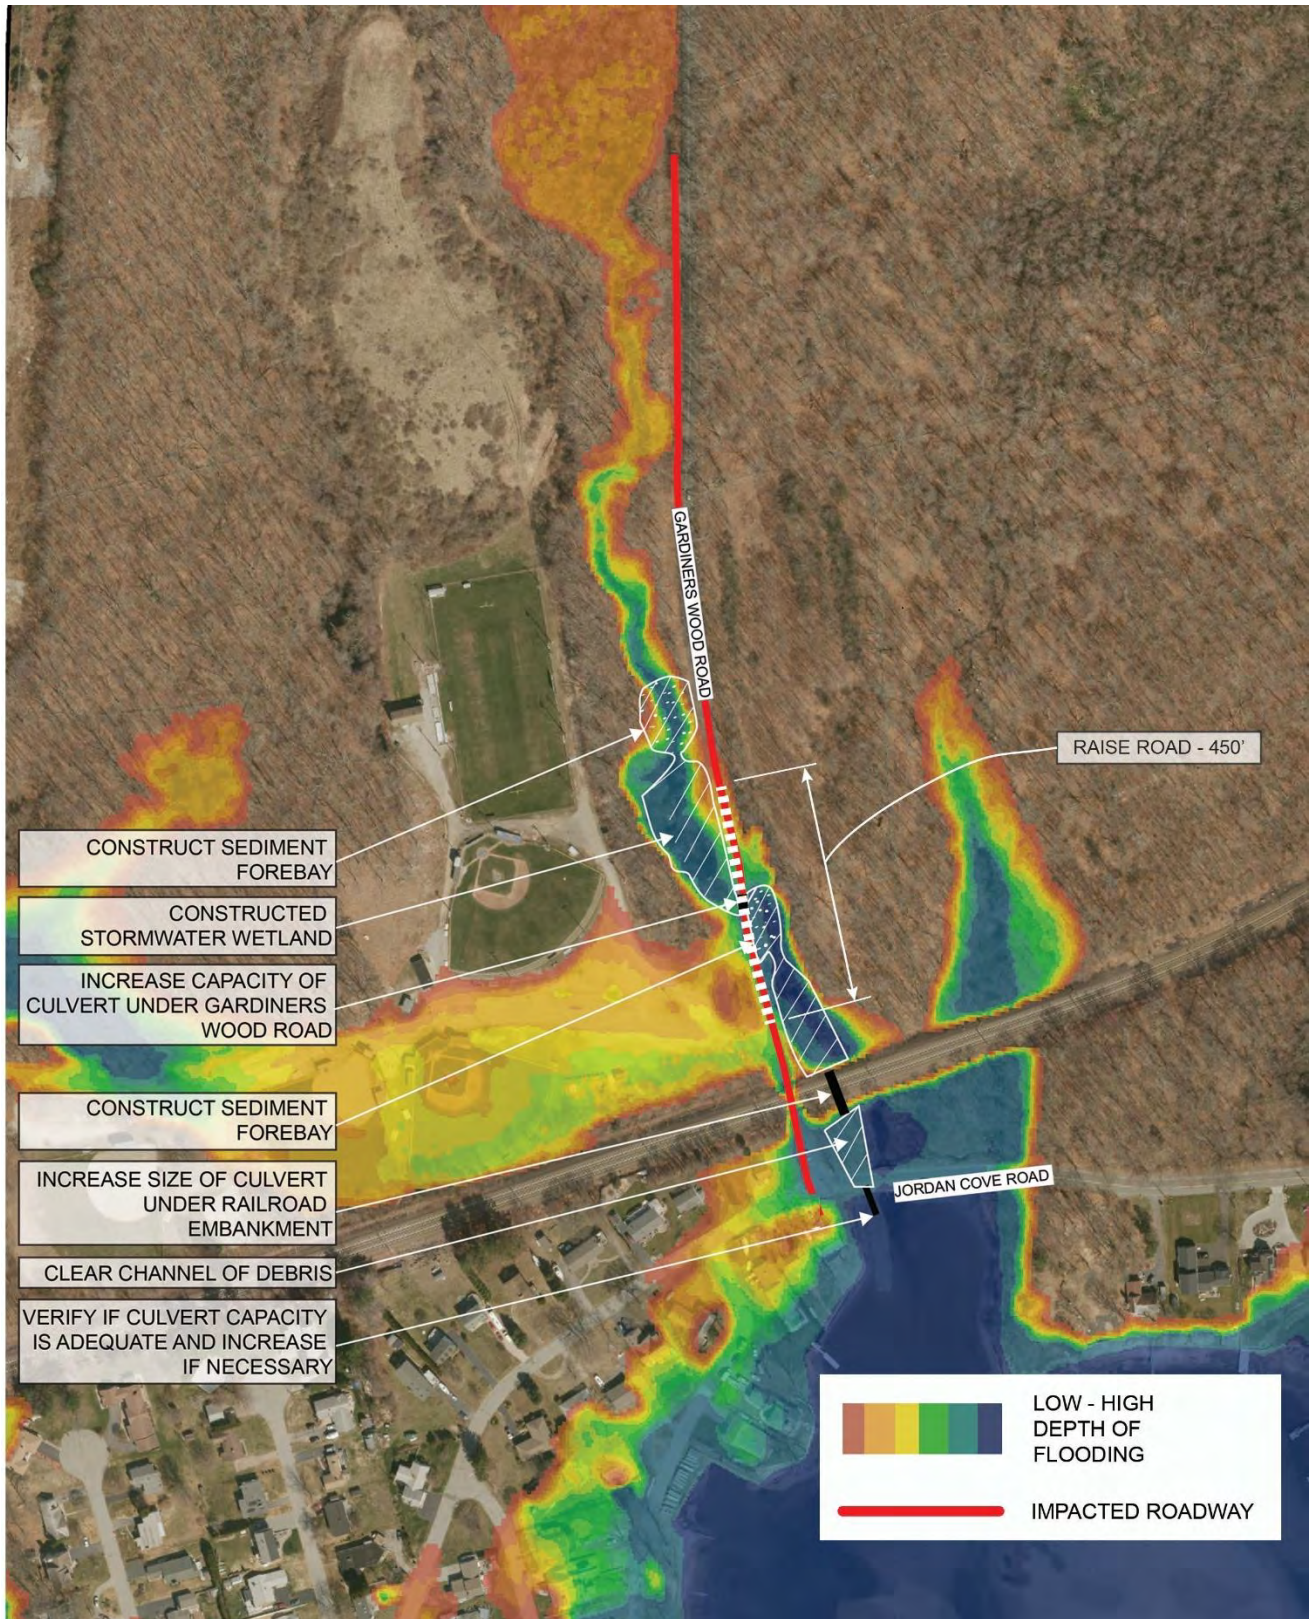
Gardiners Wood Road Adaptation Strategy No. 1 - 2070, 100-Year Coastal Flood Scenario
